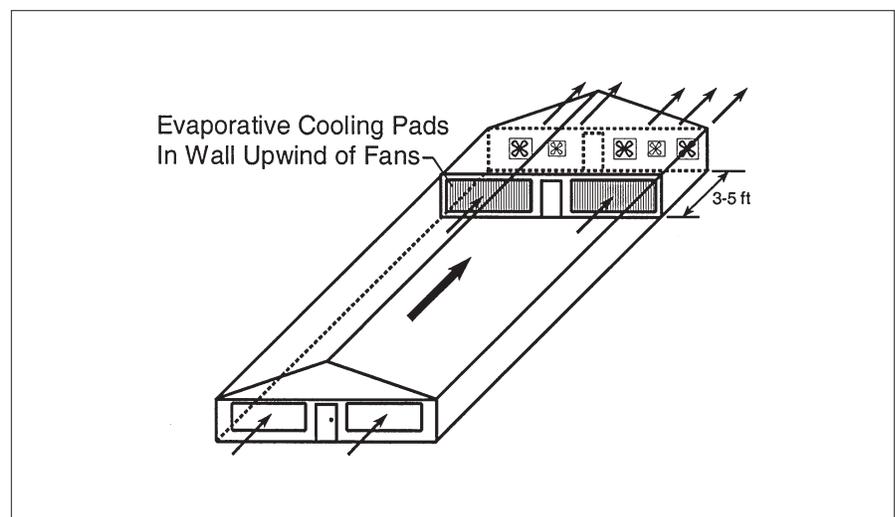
Evaporative cooling pad installed as a wet scrubber in a tunnel-ventilated swine building.
